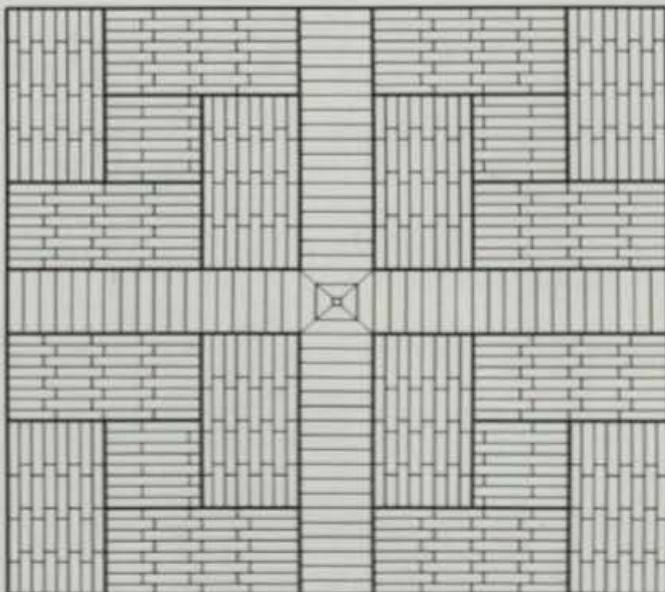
Wazir Khan Mosque, Lahore - cut and dressed flooring in geometrical pattern.
